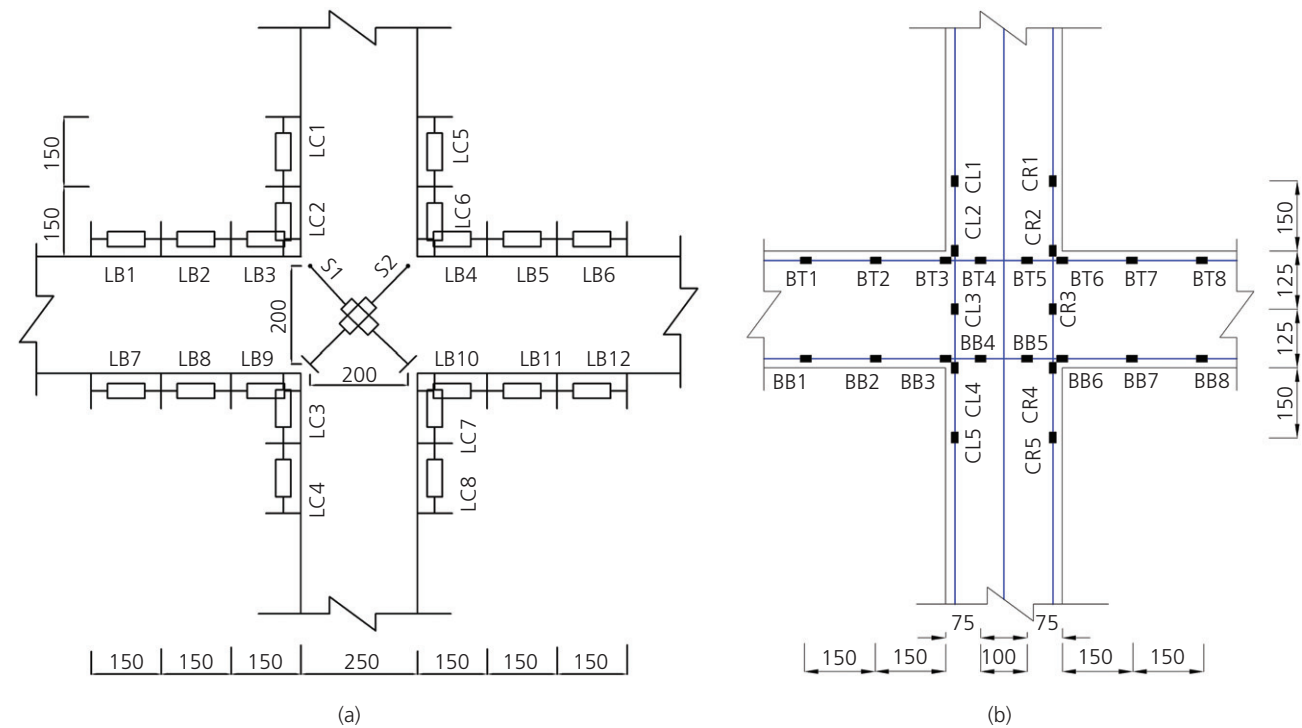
Instrumentation: (a) layout of LVDTs; (b) layout of strain gauges
